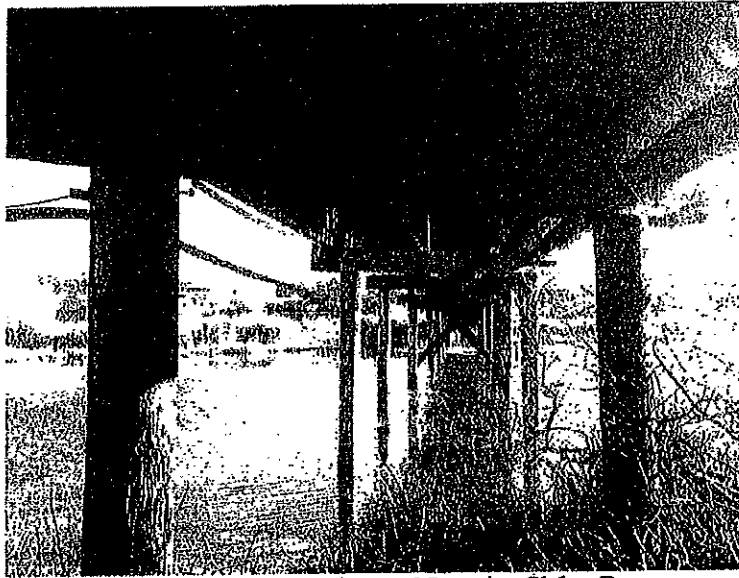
Piers, Cross Members and Spanning Glulam Beams
